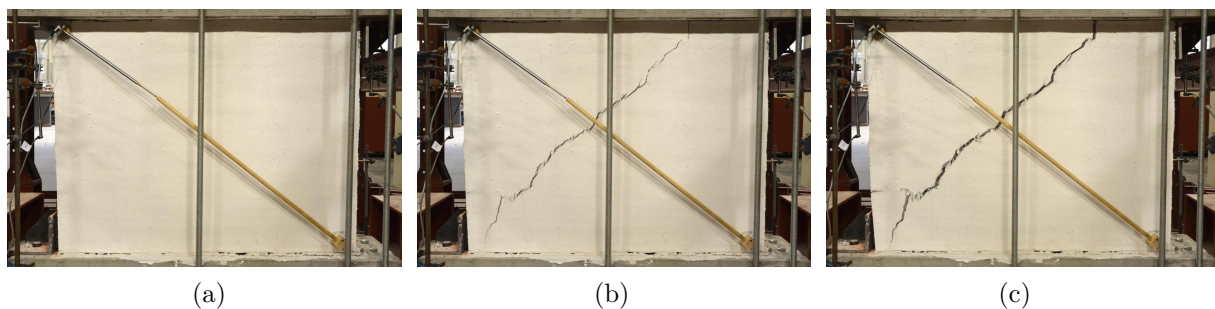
SW-220-15-2 (a) before SHCC cracking (b) Localized SHCC crack formed (c) Corner debonded and localized cracked open wider.
